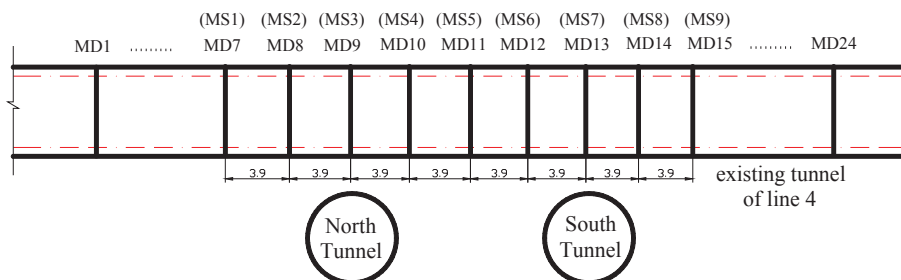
Layout of the monitoring points along the existing tunnel sections.
